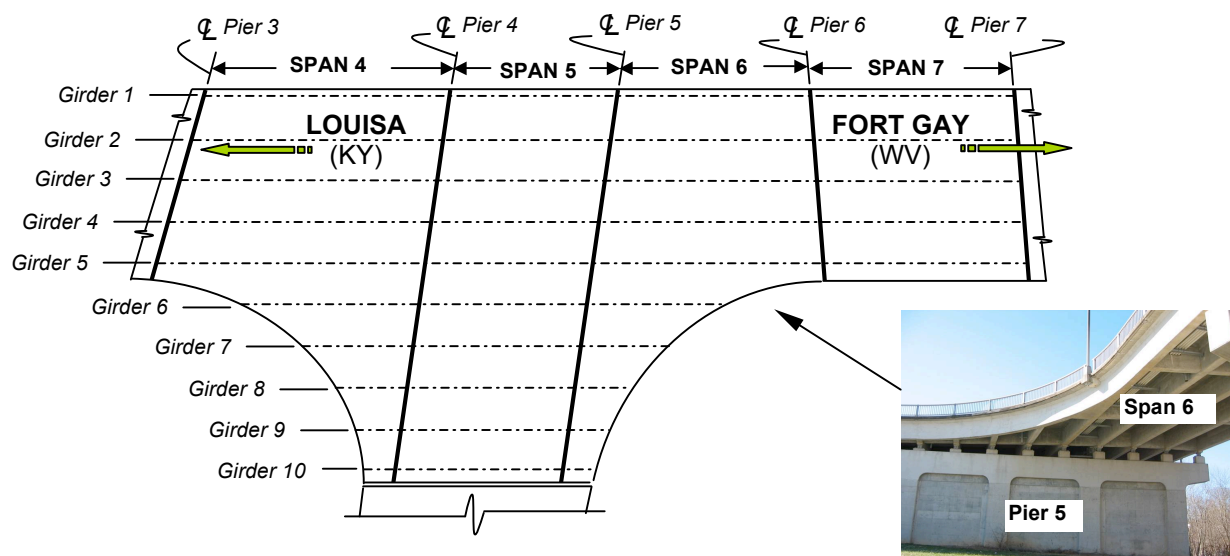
The reinforced concrete spans of the Louisa-Fort Gay bridge
